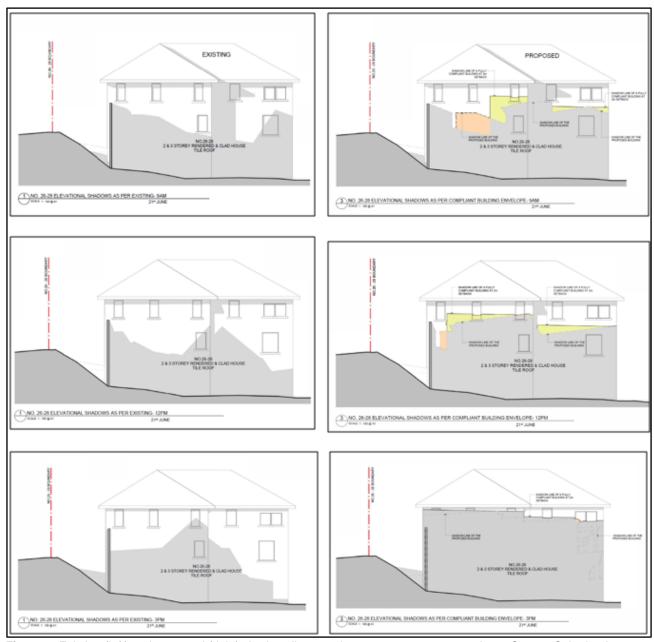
Existing (left) and proposed (right) shadow diagrams between 9am-3pm on 21 June. *Source:* Submitted Architectural Plans. <u>Note:</u> the area identified in green indicates a fully compliant envelope. The Proposal is identified in orange and/or grey with a dashed outline. Please refer to Attachment 1.
